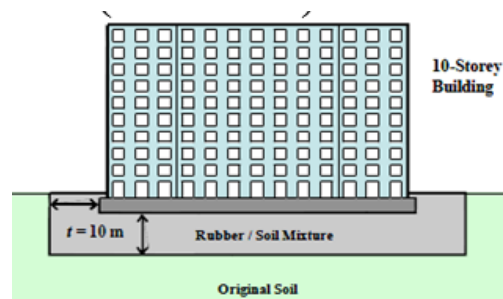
RSM system around the foundation of a building (Tsang et al, 2007, 2011).
